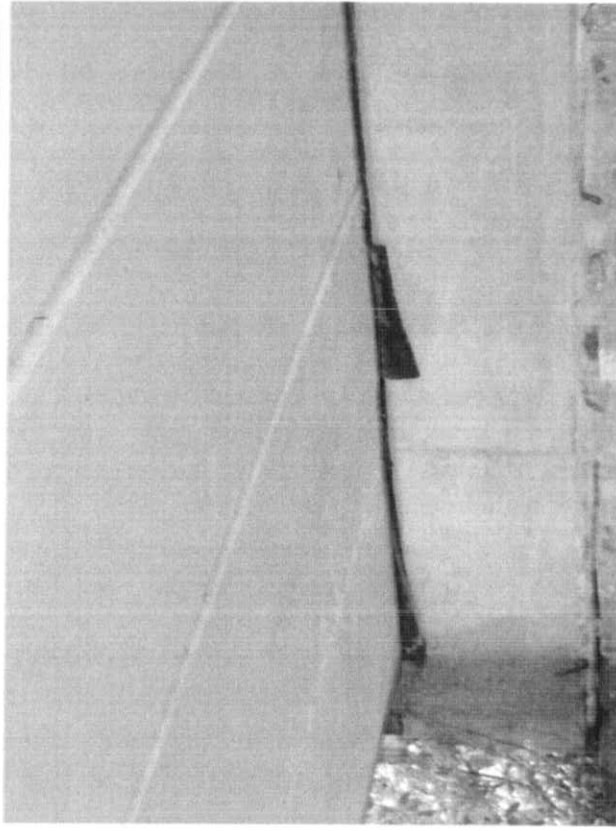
Bearing material between deck units and the south abutment cap squeezing out
